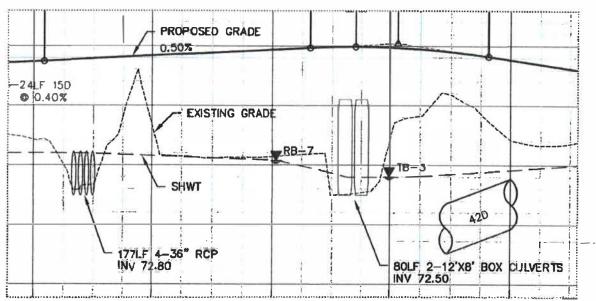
Cross-section view of Quad 36 and box culvert
